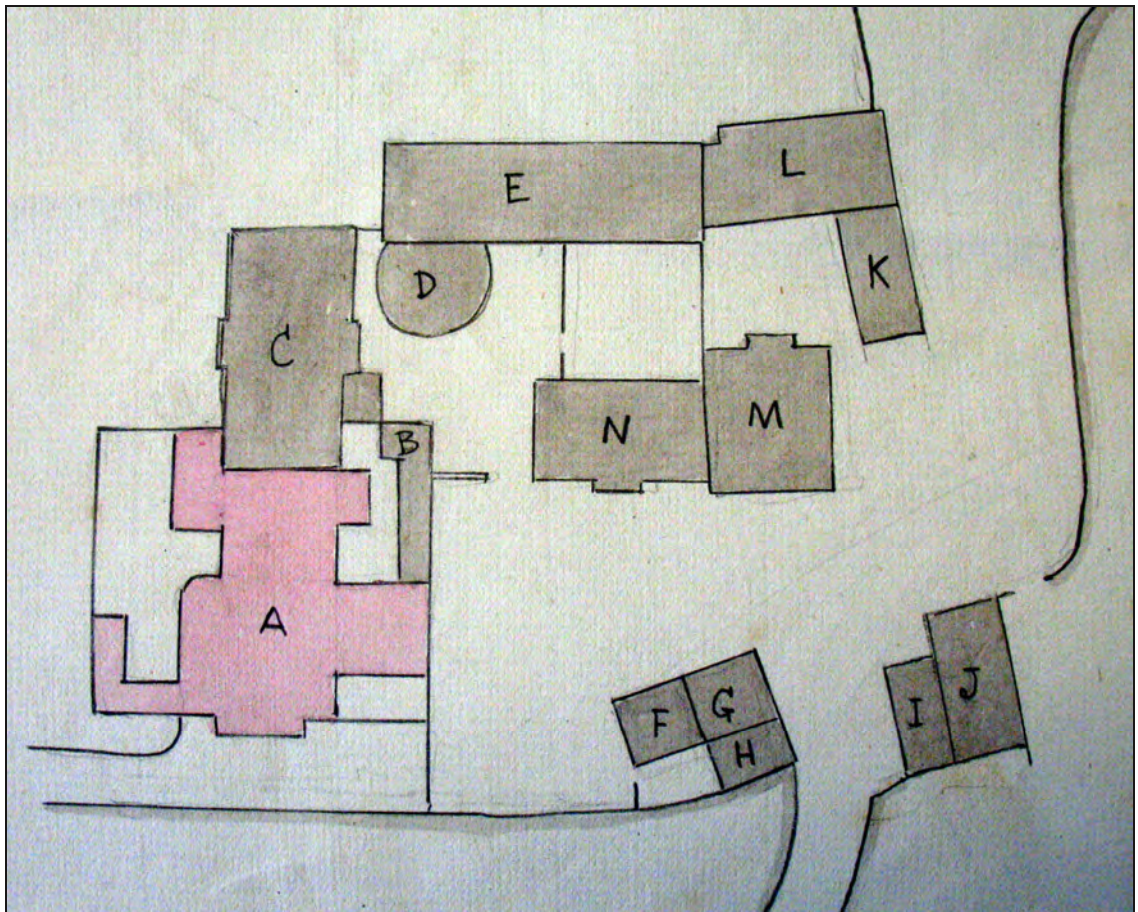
Plan of Plaistow Barton from 'Draft Particulars for the Bratton & Shirwell Insurance, 1871' (NDRO).
